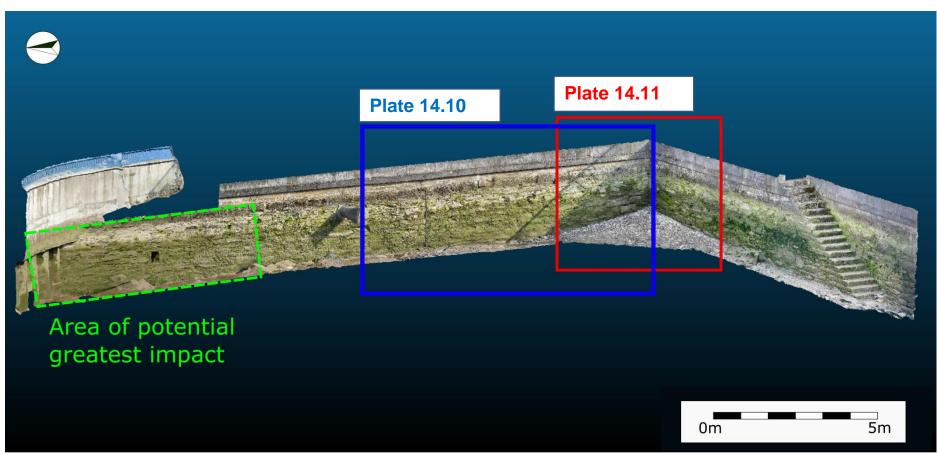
3D-elevation model of masonry quay wall, steps and flood relief wall generated from the photogrammetry survey, facing eastsoutheast.
